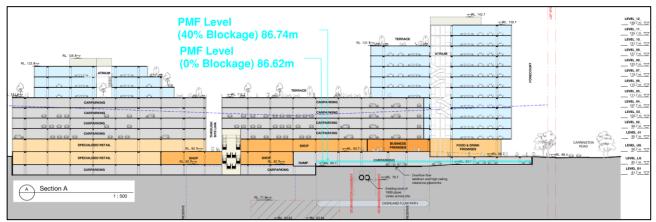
Proposed West-East Building Section at Car Park Entrance in Victoria Avenue - 0.5% AEP & PMF Levels - with and without Blockage through Car Park
